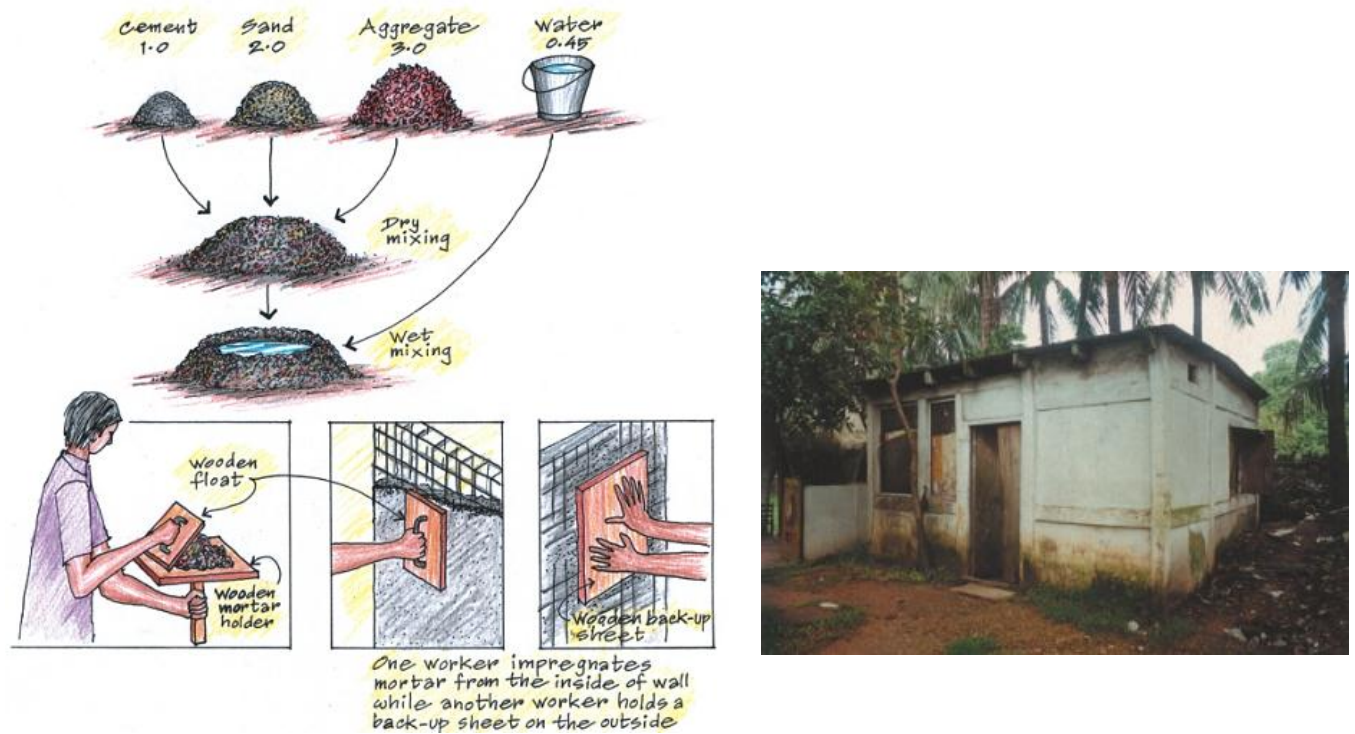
Ferro cement construction process & House made of ferro cement walls (Source: adpc report, 2005)
